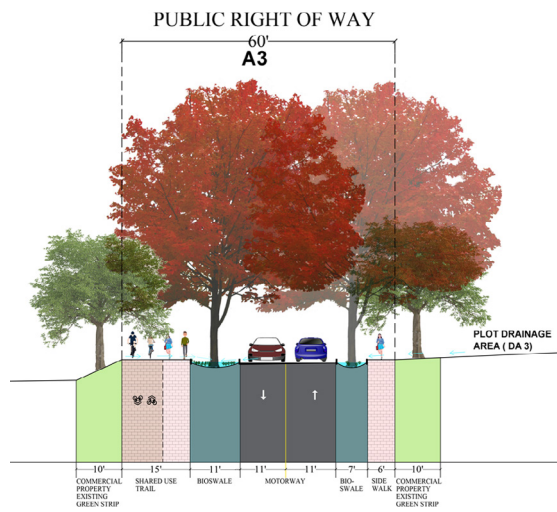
Proposed Section for Road Segment A3. (Source: Author.)
